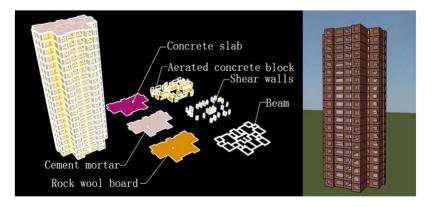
Models of the rebuilt building in Revit (left) and IESVE (right).
